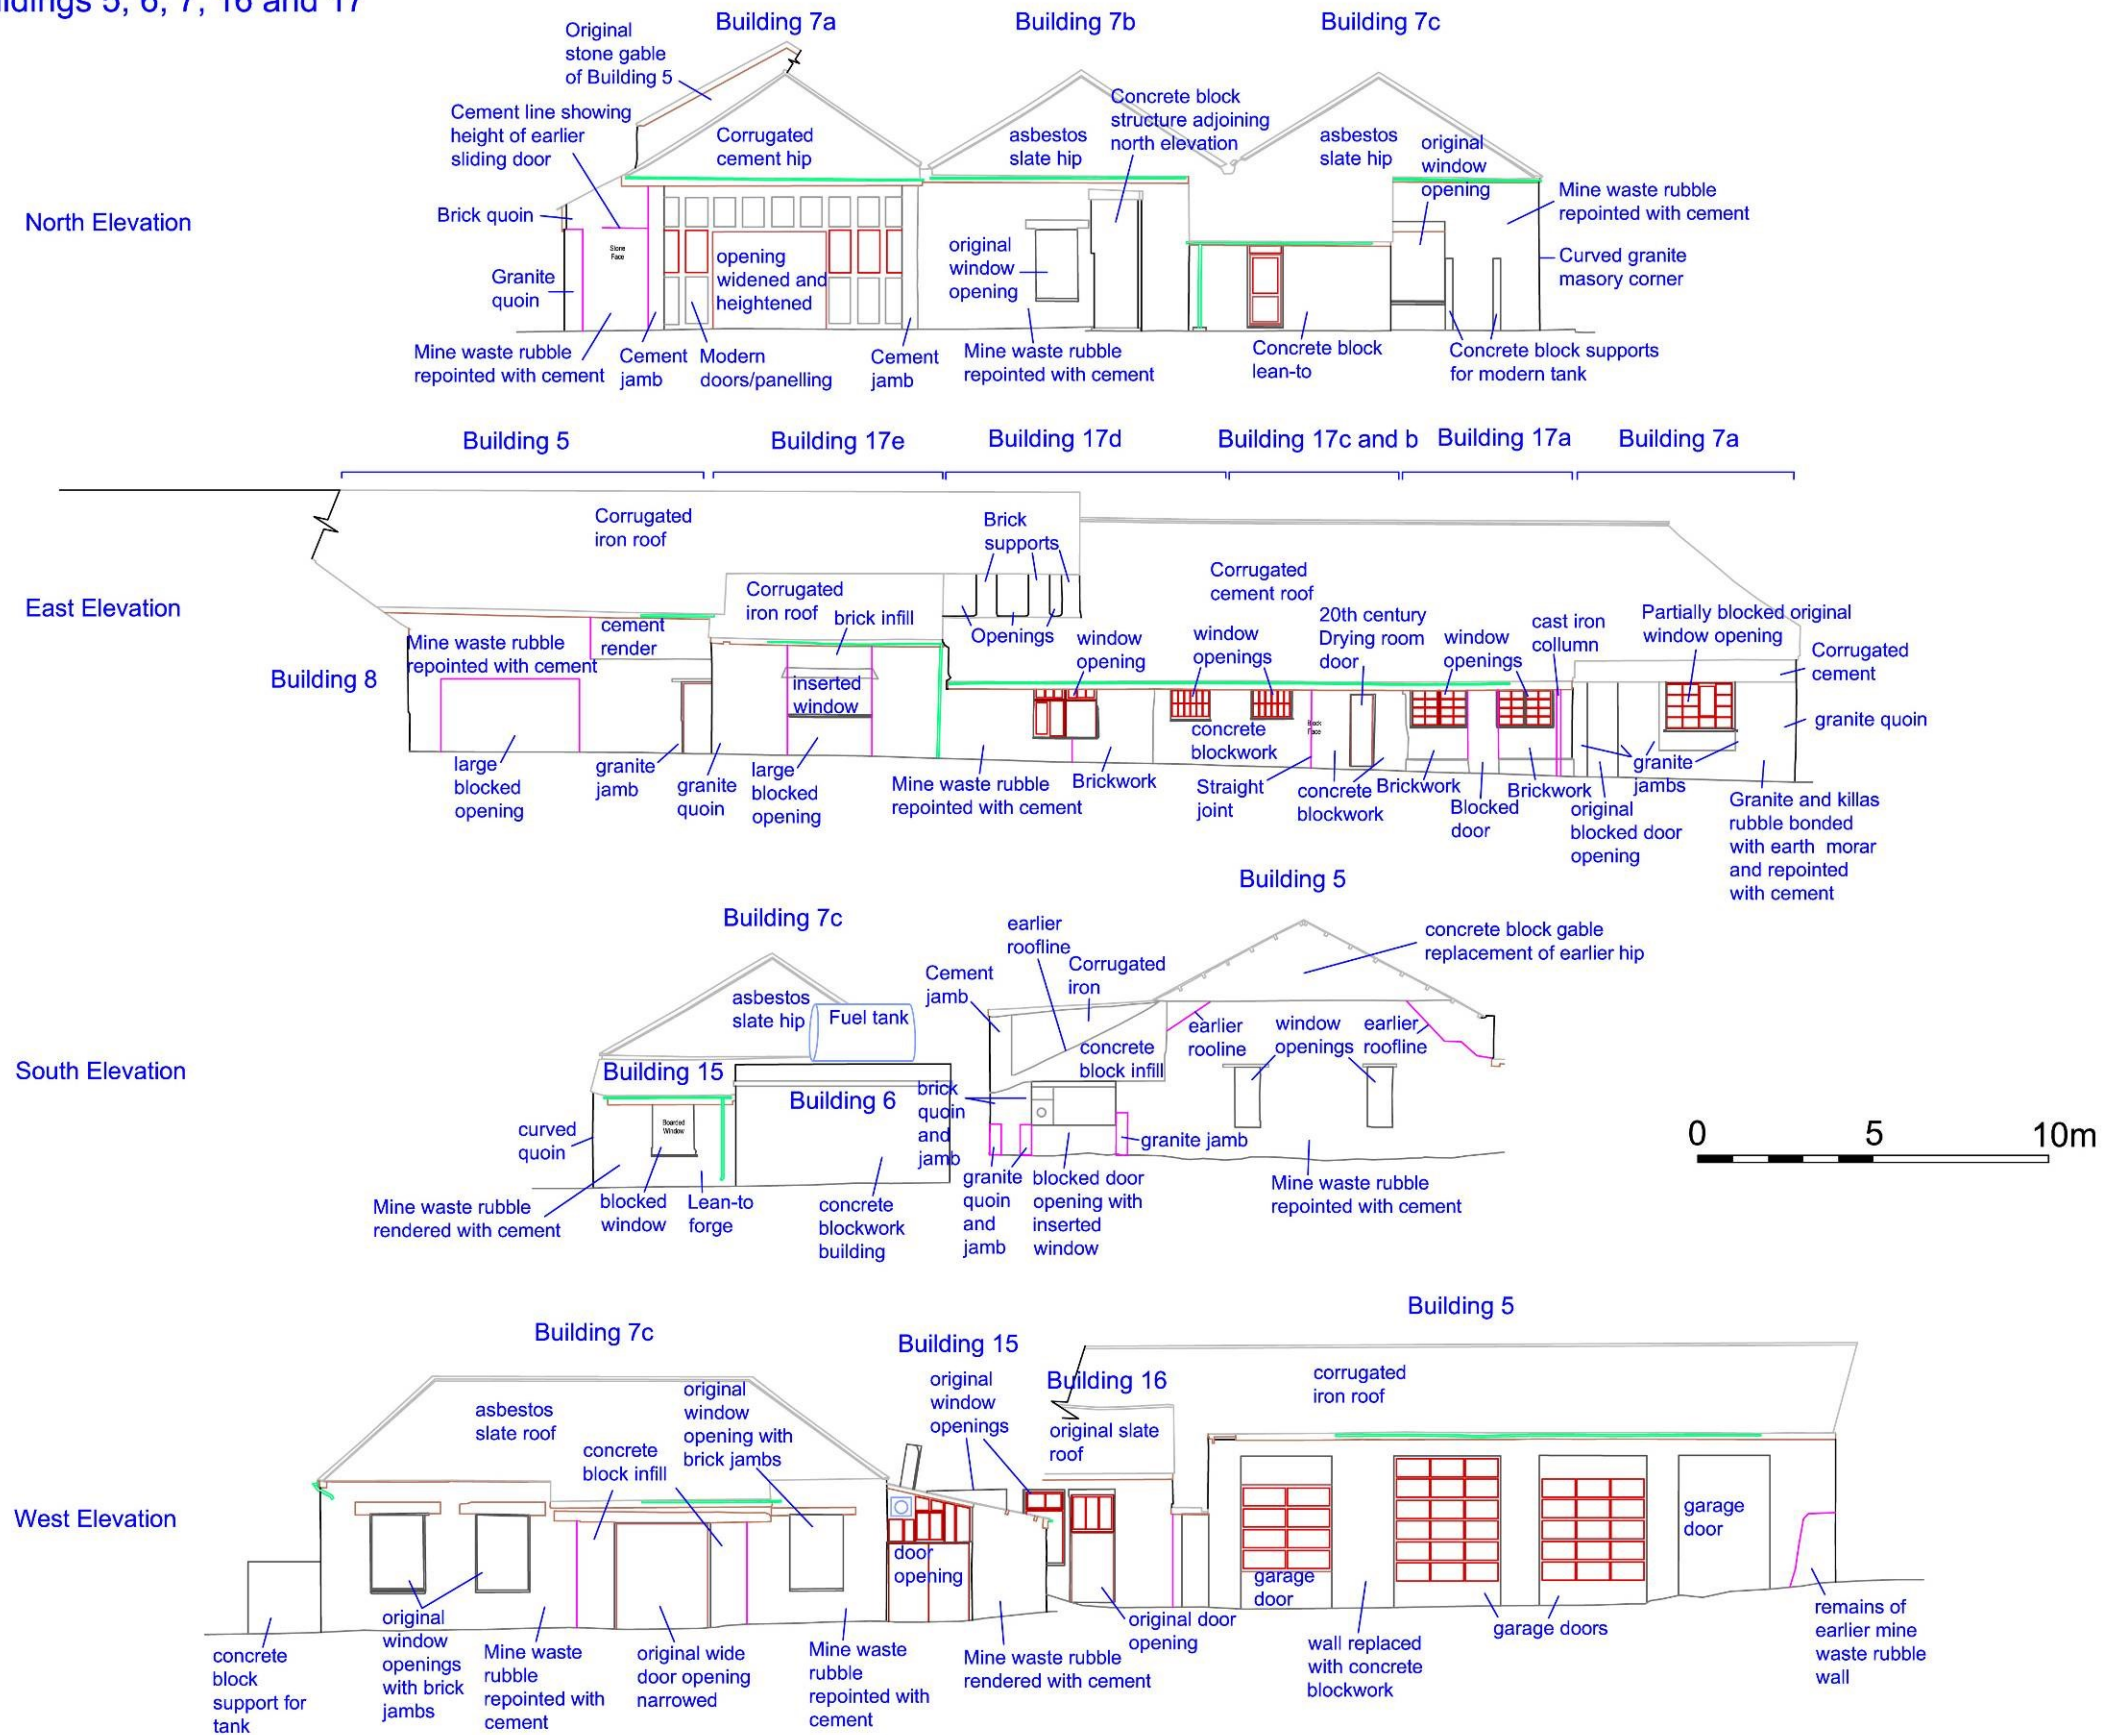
Elevations of buildings 5, 6, 7, 15, 16 and 17
